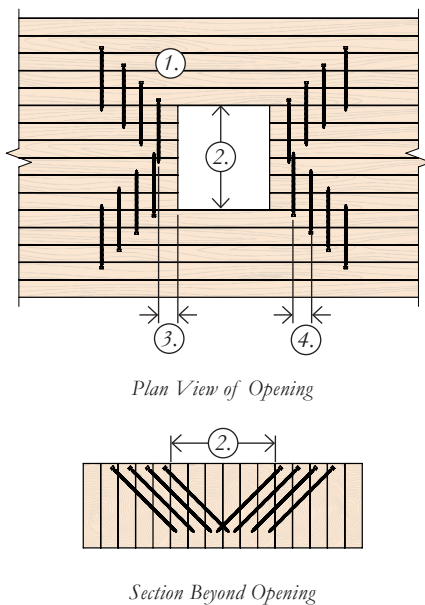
Small Opening with Fully Threaded Screw Reinforcing
